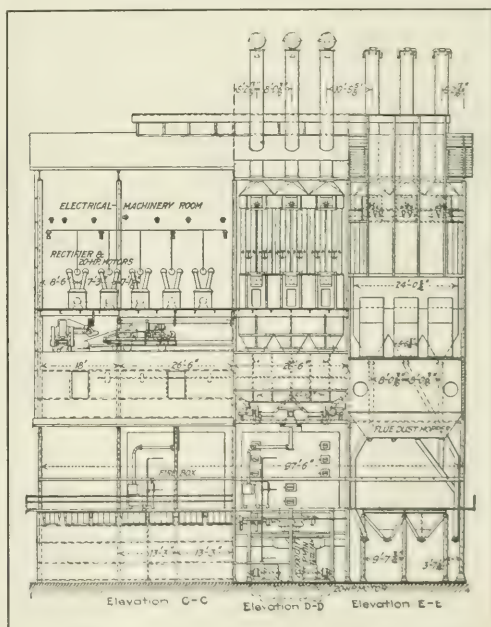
SIDE ELEVATION OF ROADSTER AND DRYER
